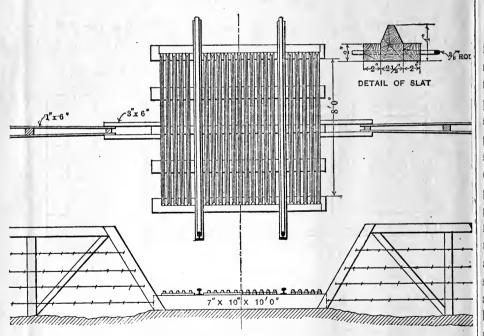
CATTLE-GUARD WITH WOODEN SLATS.
